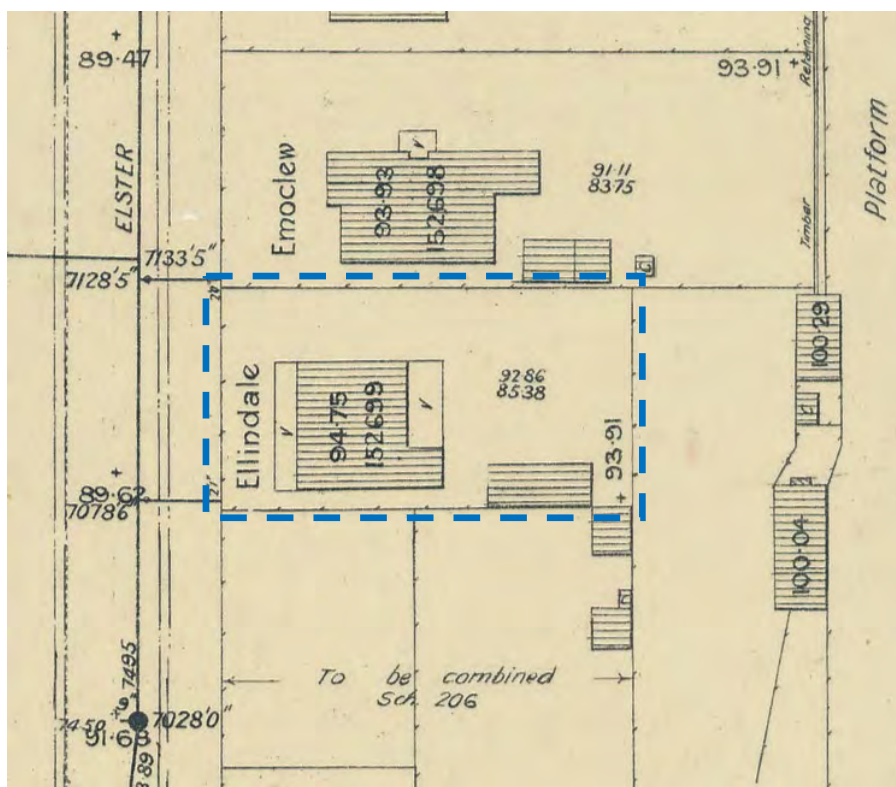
1928 plan of the property, named 'Ellindale', with a footprint of the house and outbuildings (Source: MMBW DP 2829, dated 1928).
